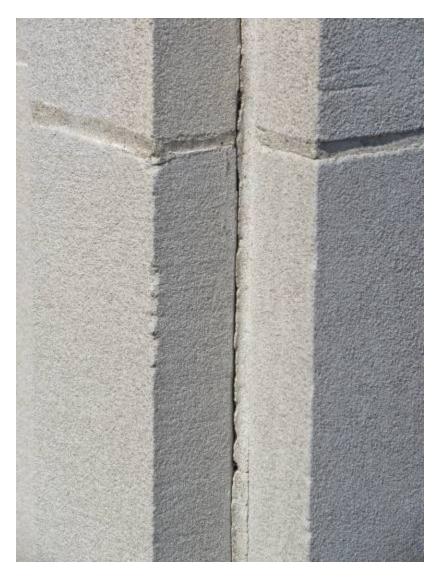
Typical deteriorated mortar joint at corner of pilaster.
